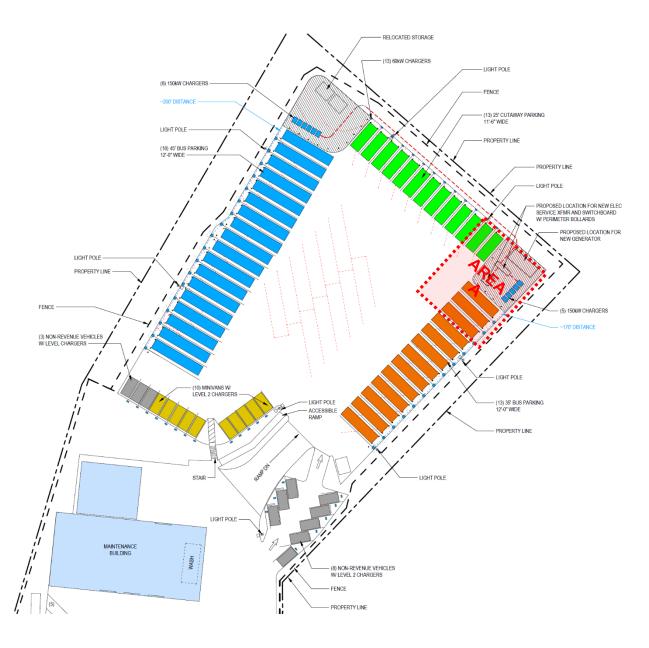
El Dorado ZEB Site Conceptual Master Plan
